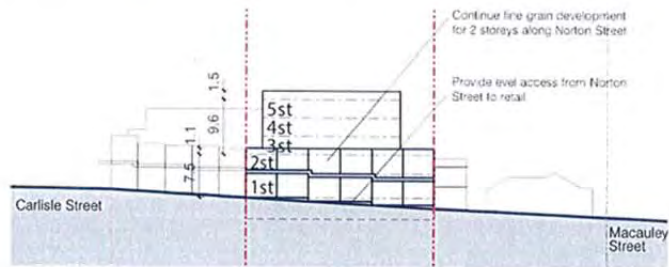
Norton Street - Building envelope - Street Elevation B-B
